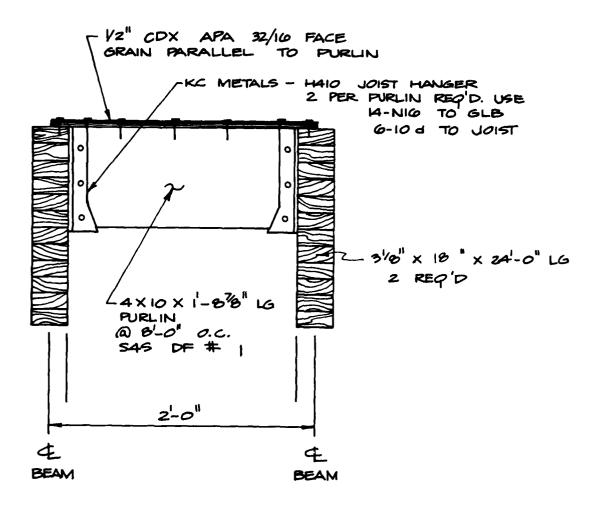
Construction Details of 3-1/8" by 18" Glulam Test Specimen.
